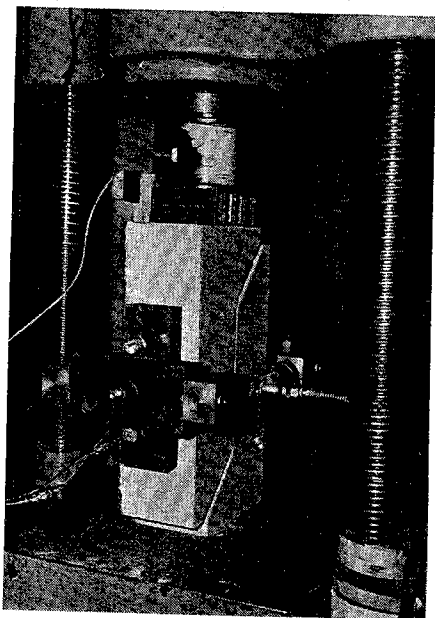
Arrangement for test of push-off specimen with tension acting across shear plane.
